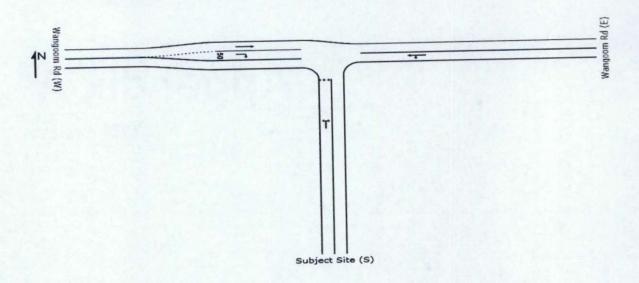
Modelled Intersection Layout - Proposed Wangoom Rd Access
